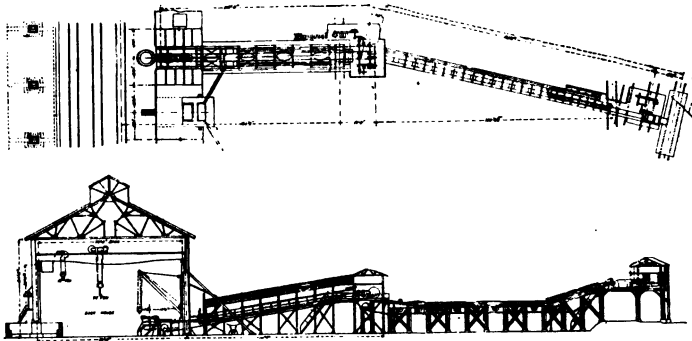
CROSS SECTION THROUGH PIG CASTING PLANT.
